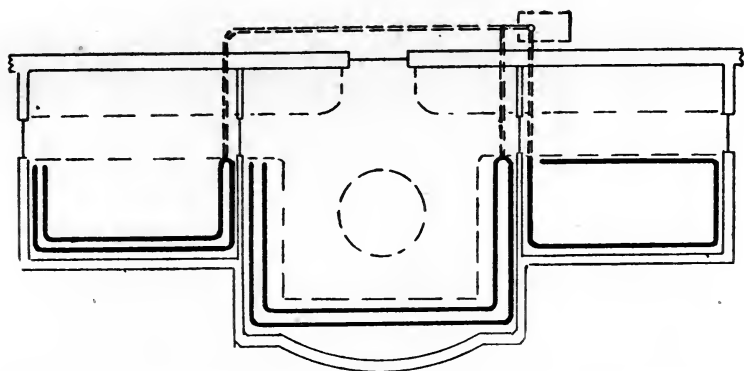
Plan of piping system for suggested vineries and winter garden.
